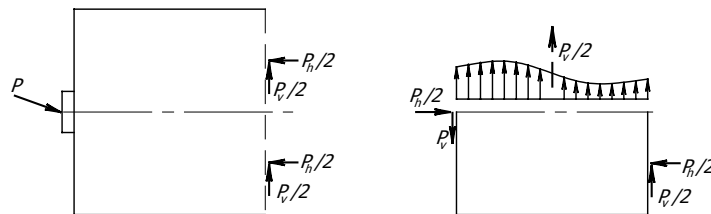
EFFECT OF INCLINED PRESTRESSING FORCE ON ANCHORAGE ZONE
